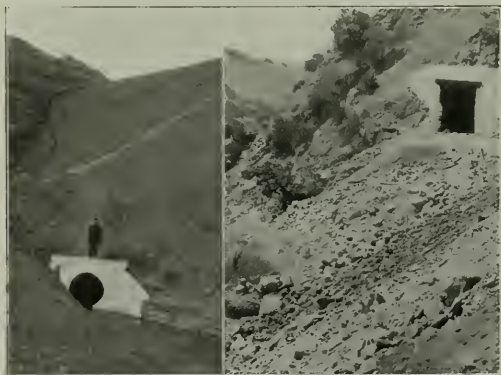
A Ten-gage, 60-in. Corrugated Iron Culvert under an 85-ft. Fill on the Western Pacific
